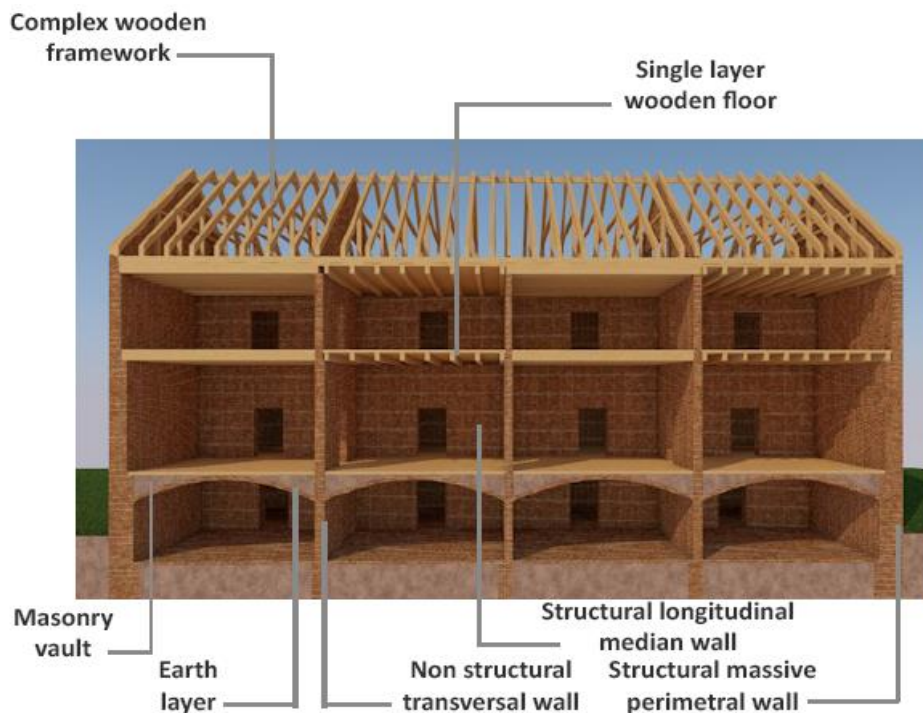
Building typology and structural layer characteristic for historical masonry buildings in Timisoara
